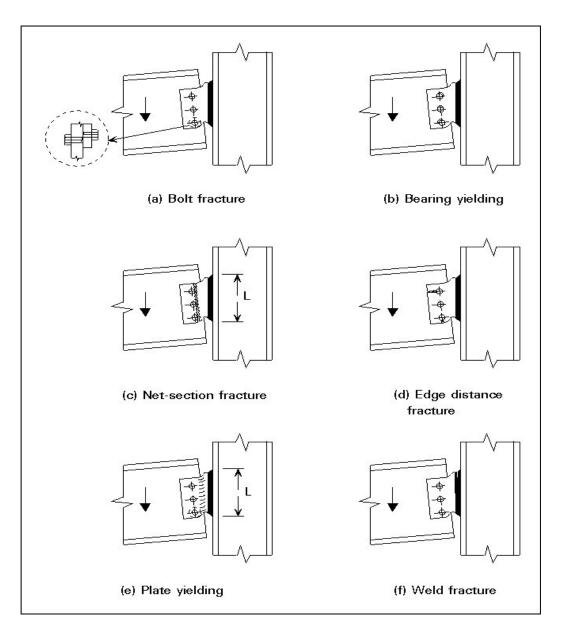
Illustrates the 6 possible failure modes for a fin plate connection
